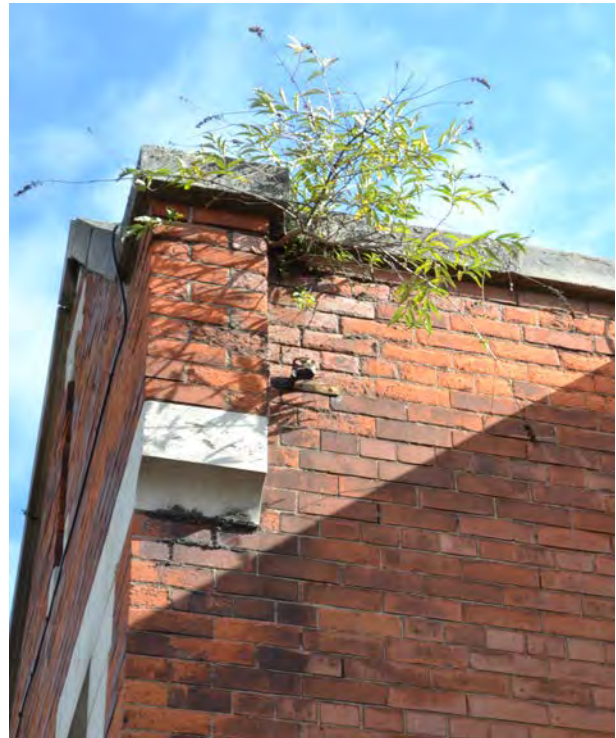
Damaged brickwork and plant growth in laundry superintendent's house.
